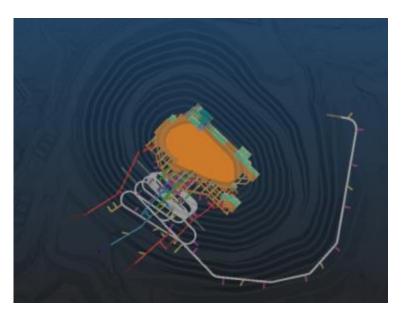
Access decline with final Stage 6 pit design - Plan View
